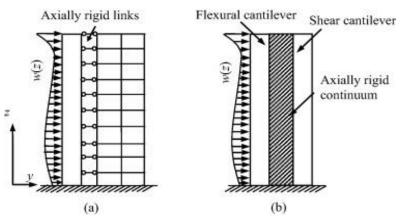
An example of a Wall-Frame Structures System (https://ars.els-cdn.com)
